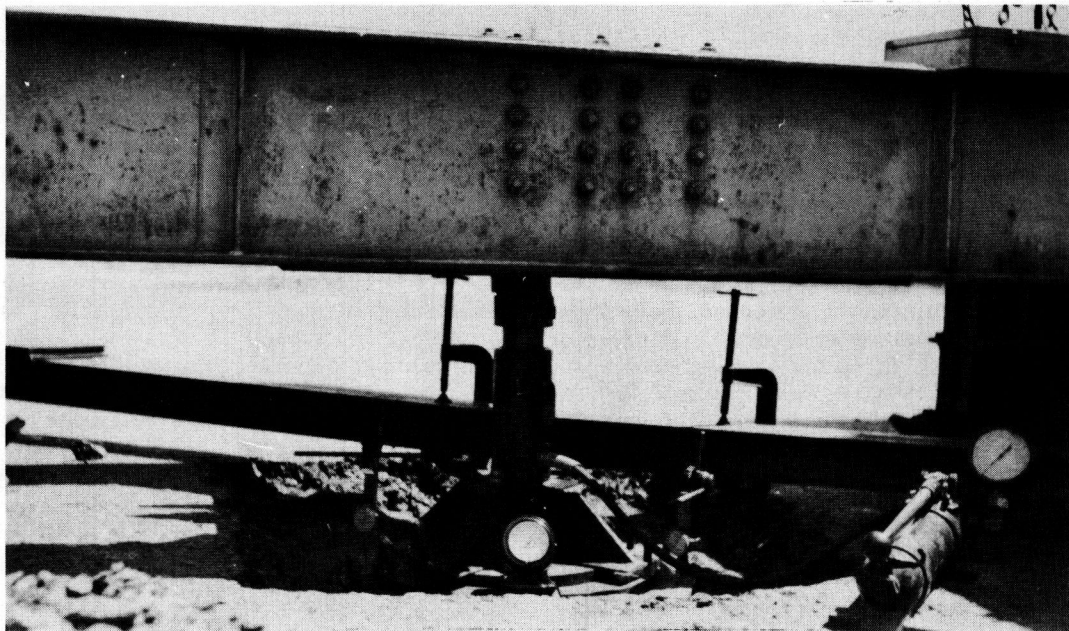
Figure A. Closeup of laboratory bearing-power equipment on South Hadley test.
